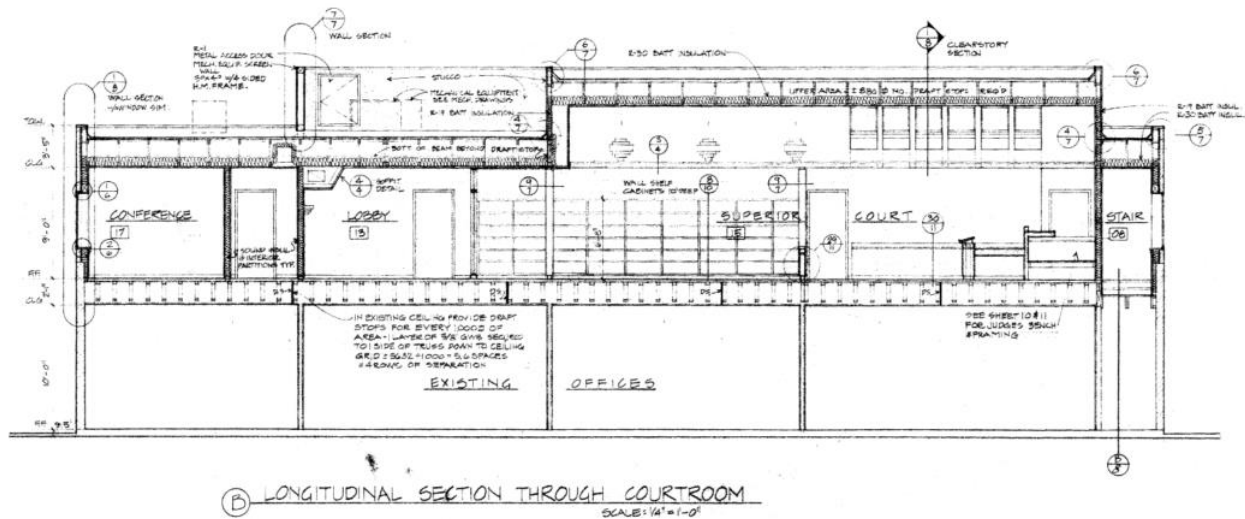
Detail B on Sheet 7 of the 1984 Second Floor Addition drawings depicts a section cut through the building looking North.
